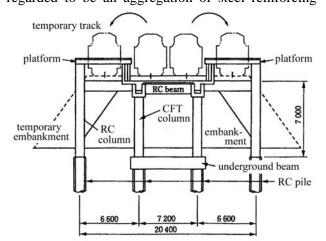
Conversion of track embankments to elevated track using concrete-filled tubular steel columns
